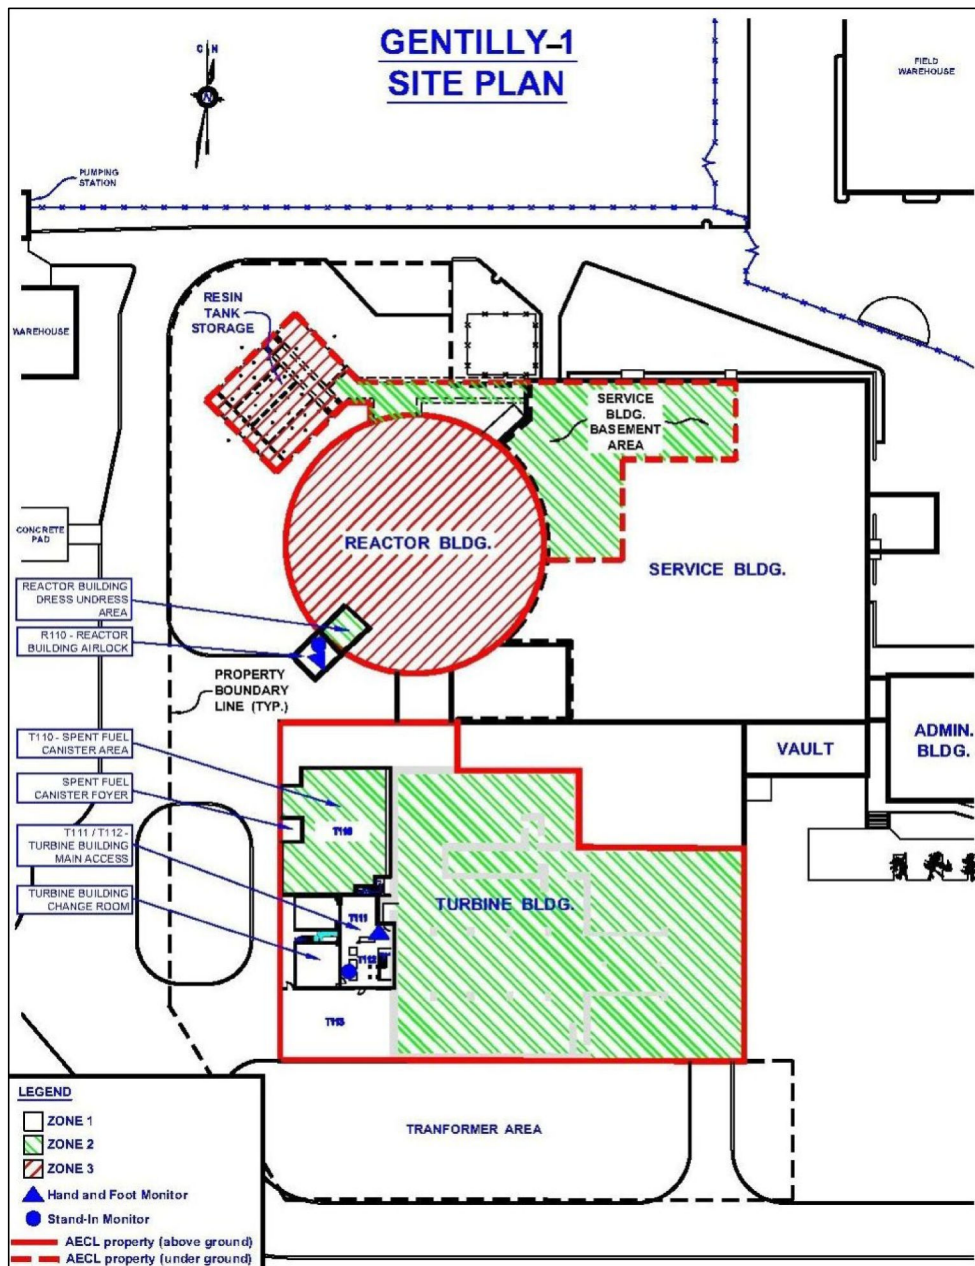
Gentilly-1 Waste Facility Layout and Zoning Plan
